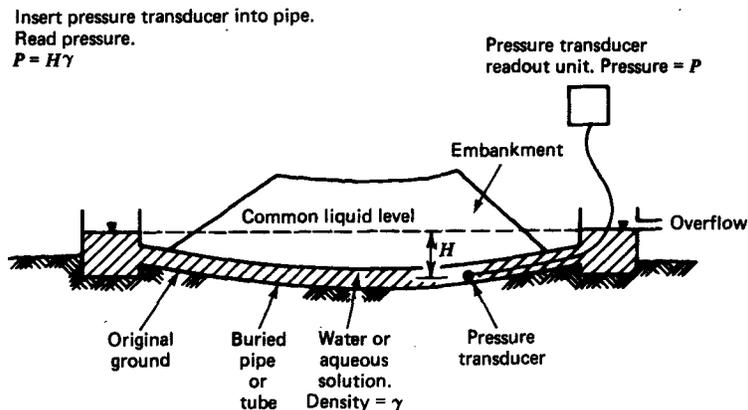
Schematic of full-profile gage, without attached liquid-filled tube.
